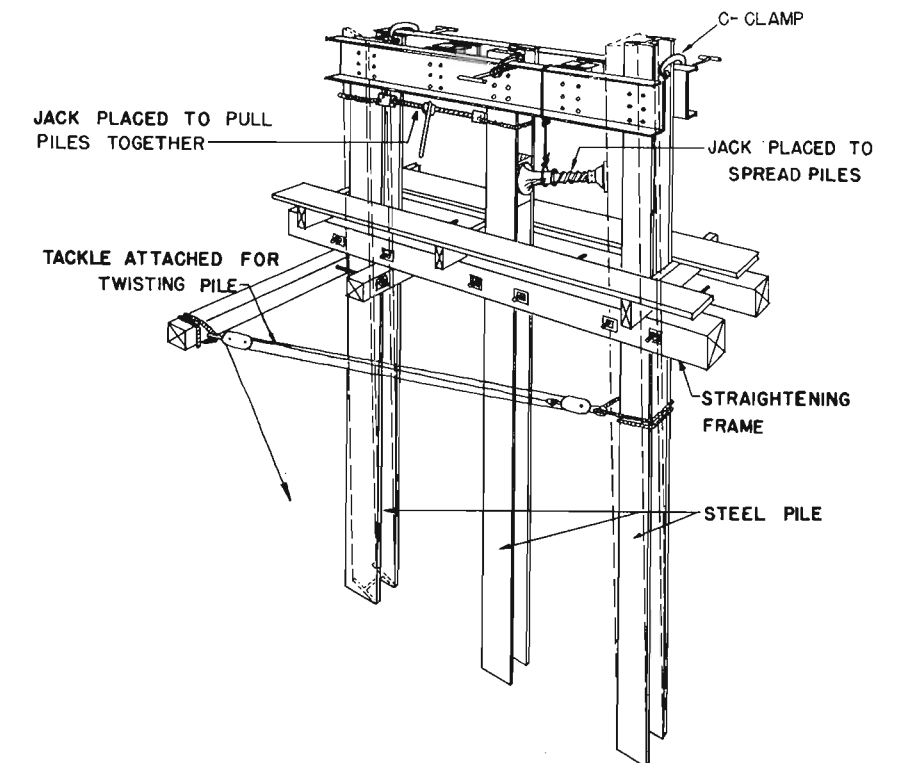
Pulling steel piles into position before drilling to connect cap and bracing.
